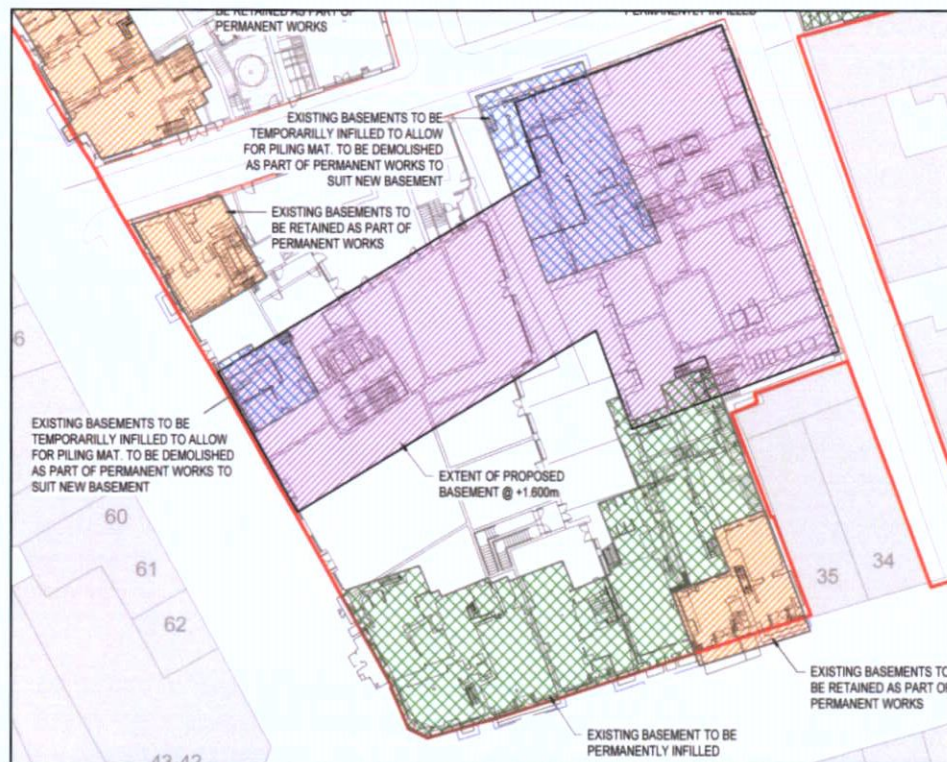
Site 3, Basements to be retained (orange), permanently infilled (green) and temporary infilled in advance of piling for new basement (blue), extent of the proposed basement (pink).
